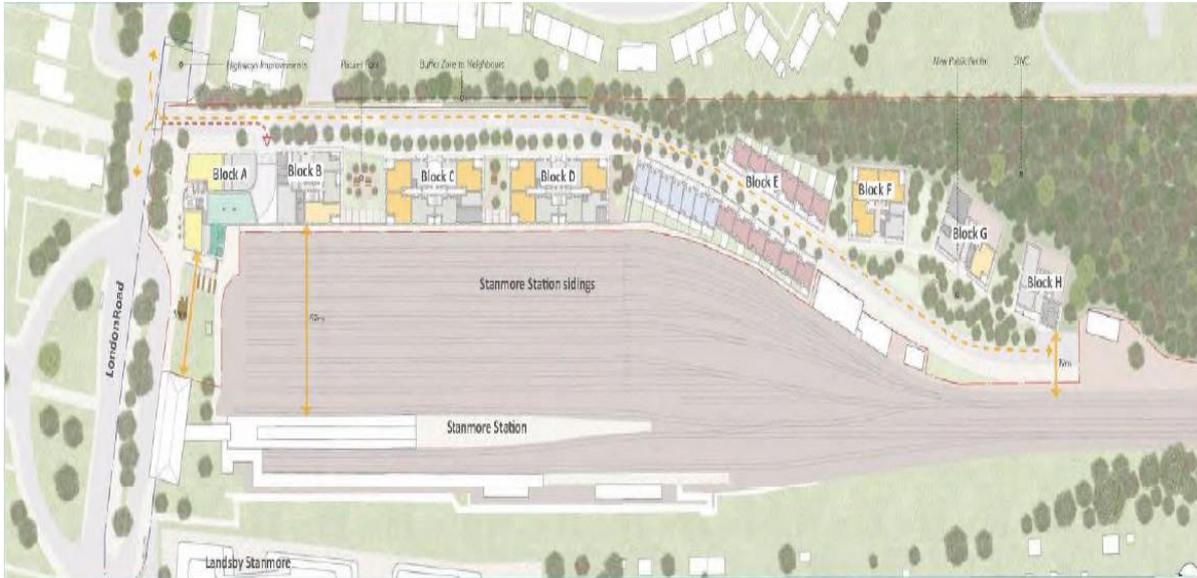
Proposed Site Plan (Wrenkusa/ur/Carson Architects)
